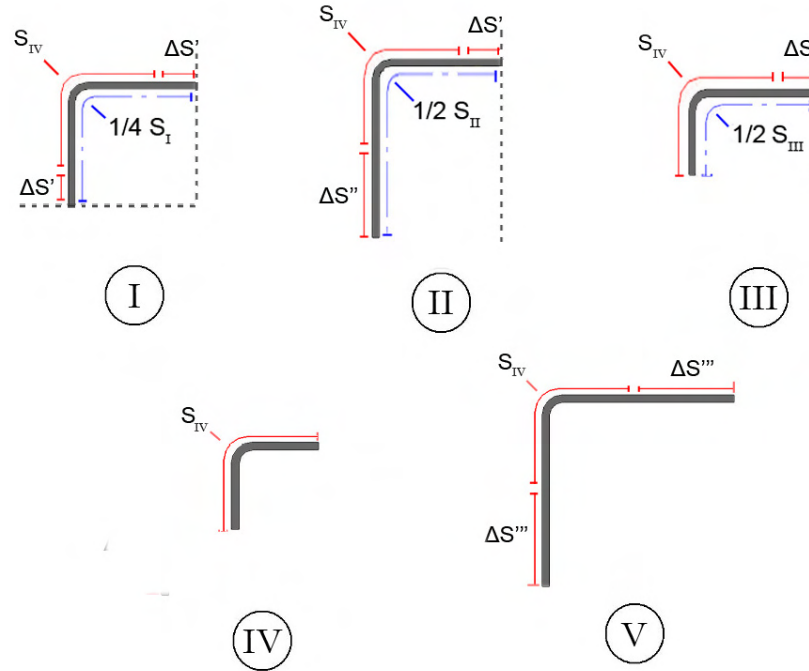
Subdivision of section length into a corner detail and portion of flat segment, for each of the five specimen cross-section geometries considered.
